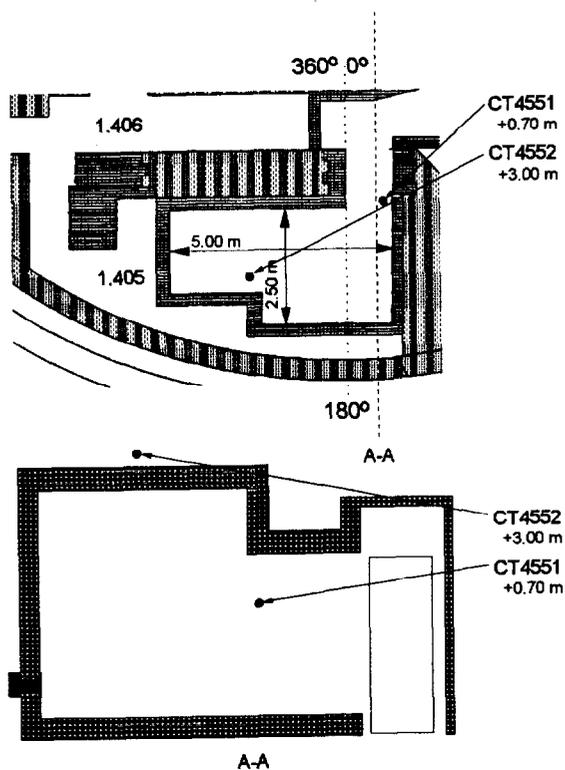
Fire Room Vertical Cross Section for T51.1
